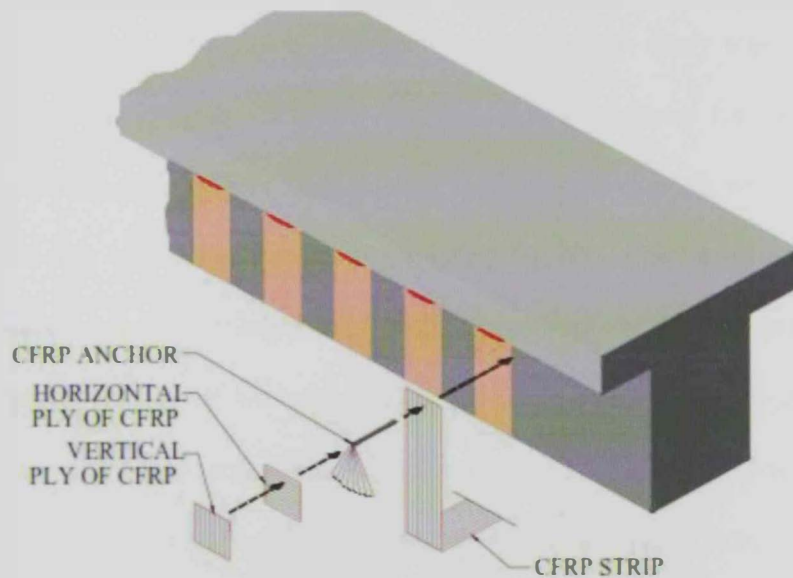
Isometric view-Details of CFRP anchors (Kim et al. 2011)
